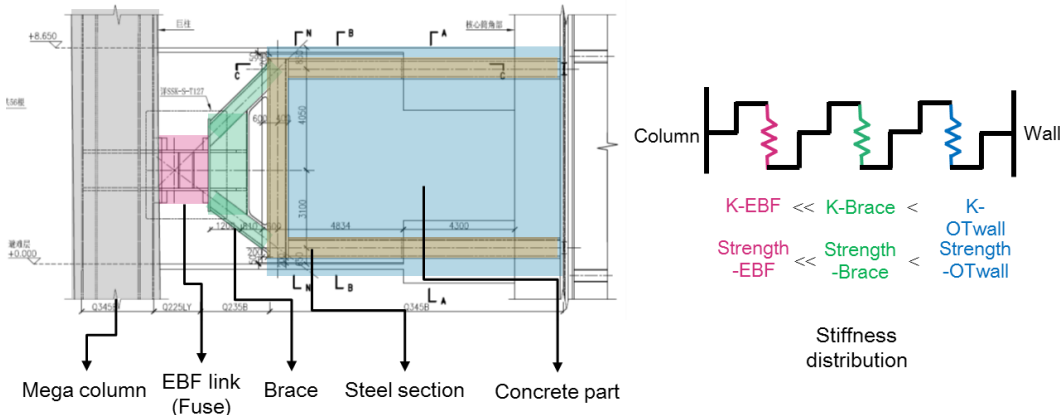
RCCQ Project – Hybrid outrigger concept © Arup
